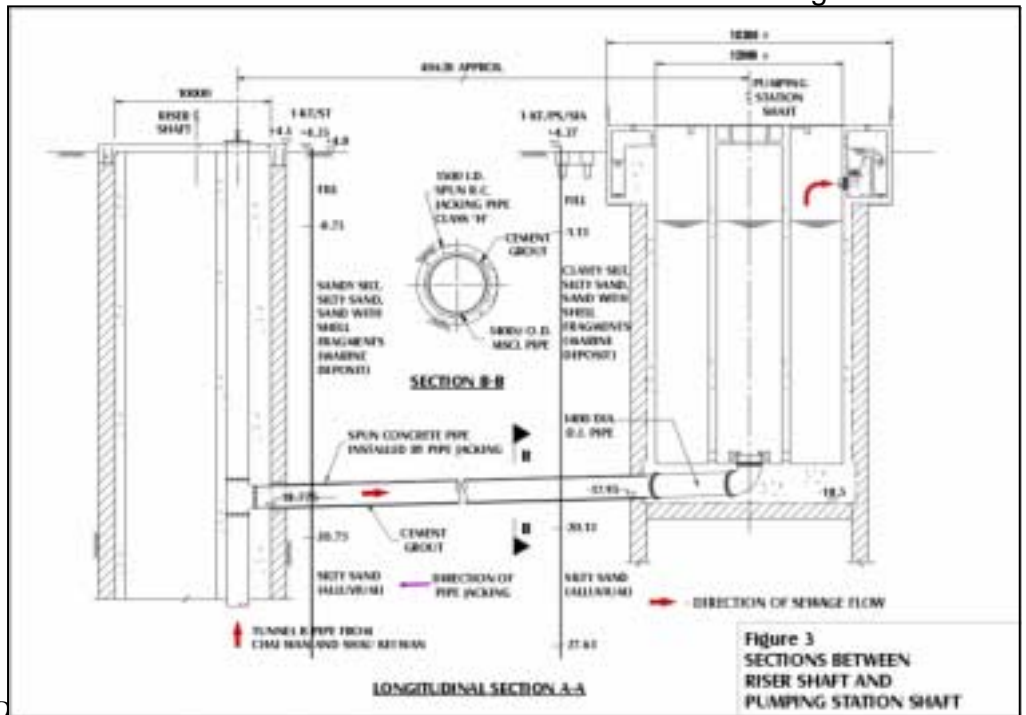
SECTIONS BETWEEN RISER SHAFT AND PUMPING STATION SHAFT
